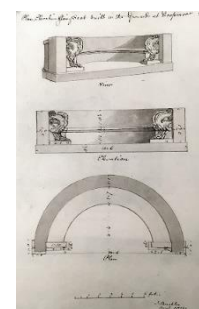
Plan Elevation & View of a Seat built in the grounds of Dropmore August 1824, f. 88
